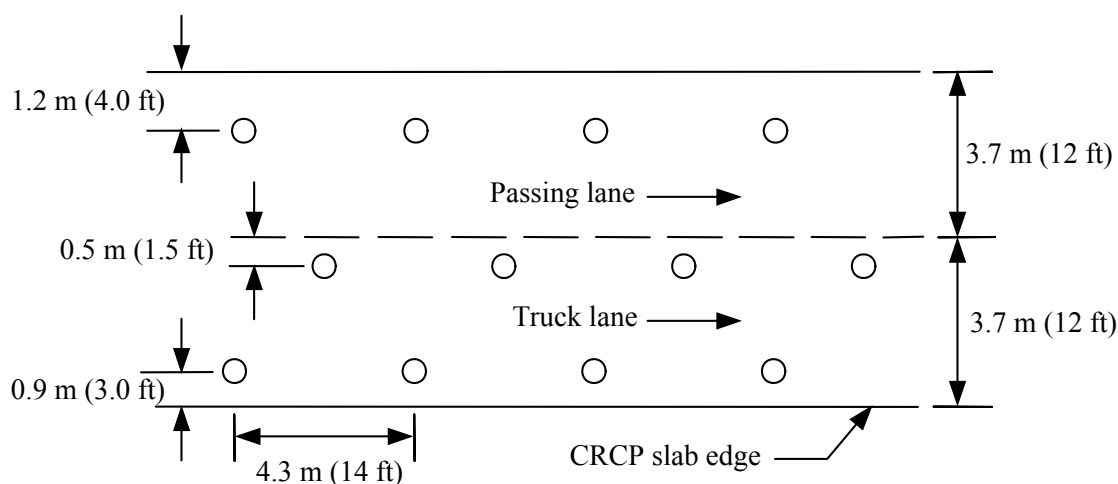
Hole pattern used on a continuously reinforced concrete pavement (Barnett, Darter, and Laybourne 1980).
